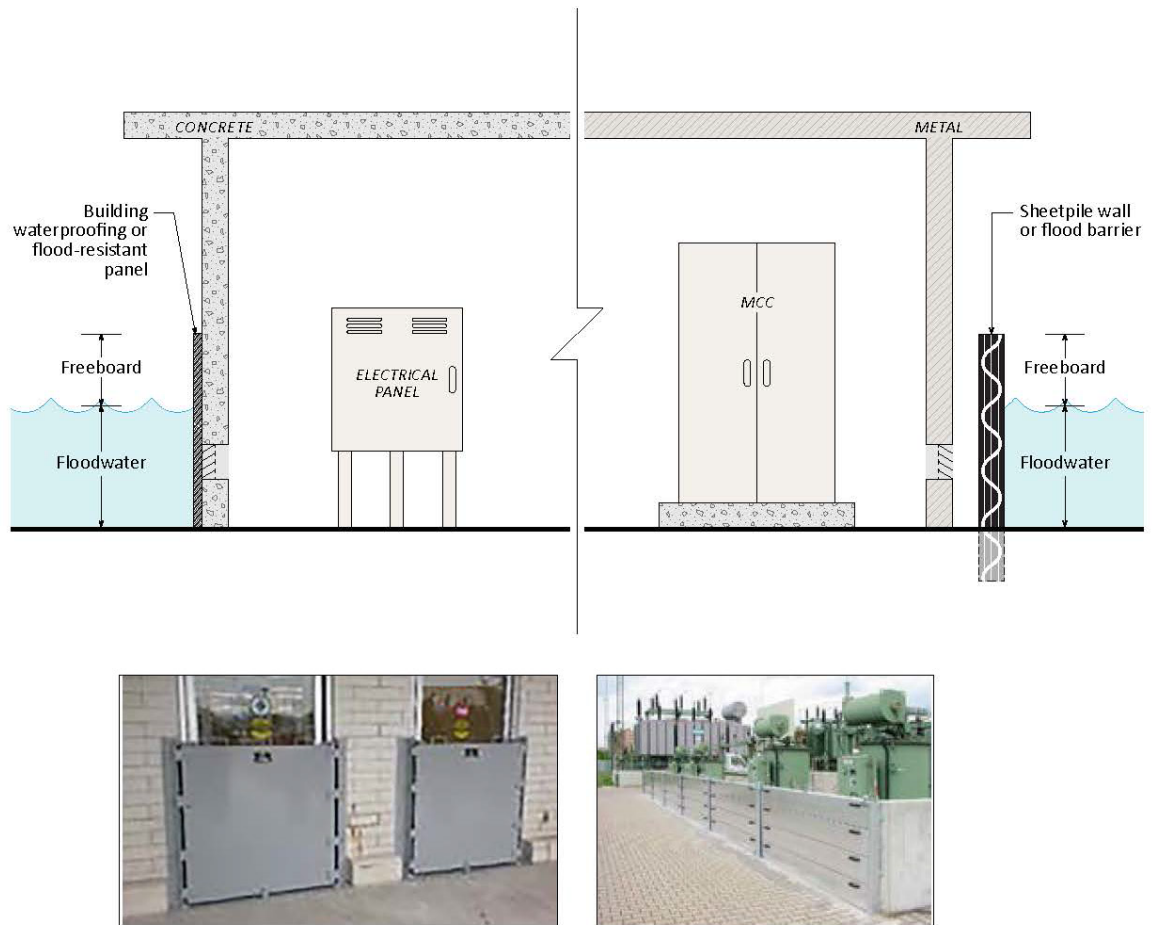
Dry Floodproofing – Installation of Static Barriers for Facility Protection
